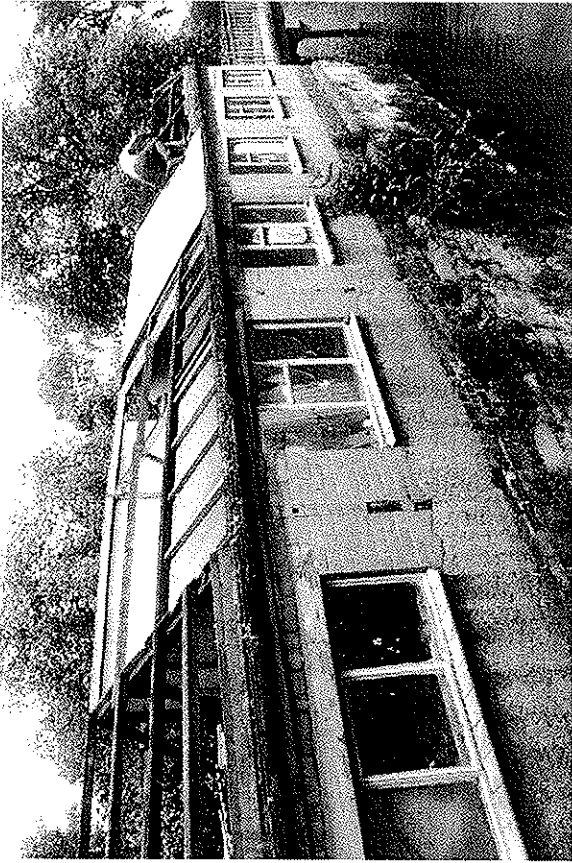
Building B/1.1-1.2 from the south-west showing primary roof structure and timber posts set into secondary beton-pisé and concrete brick walls. Note historic stone walling of wharf side beneath.
